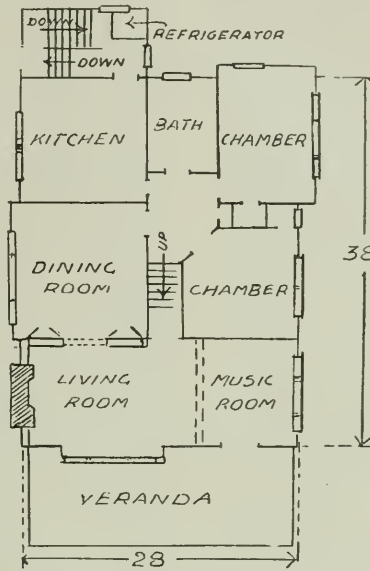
Floor plan of a successful bungalow, costing \$5,100 complete
